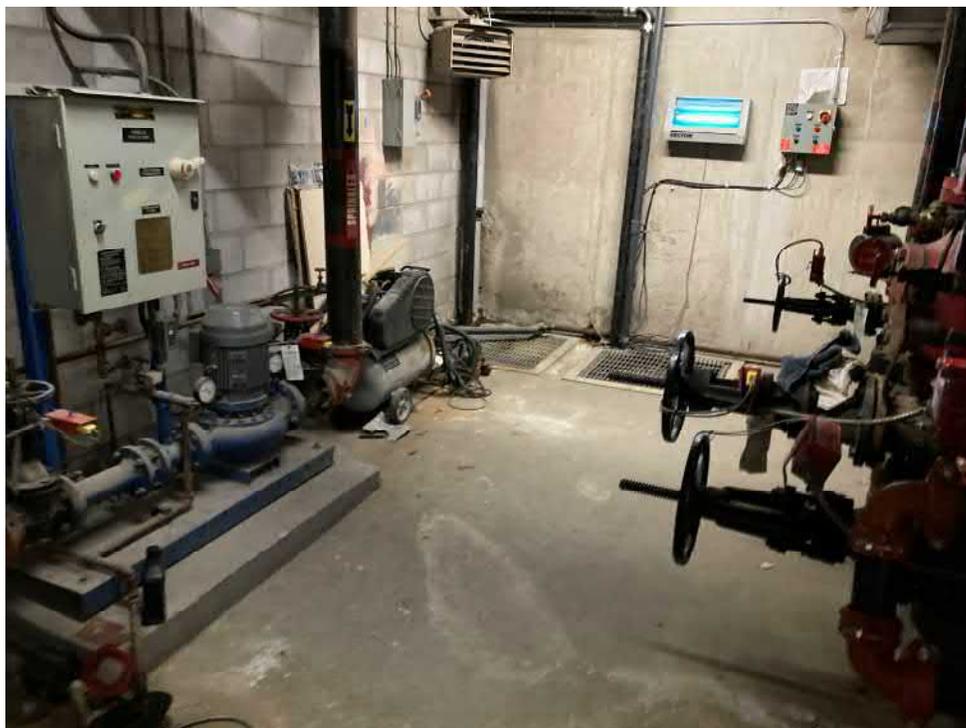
Basement mechanical room showing sprinkler pumps and sump pits
